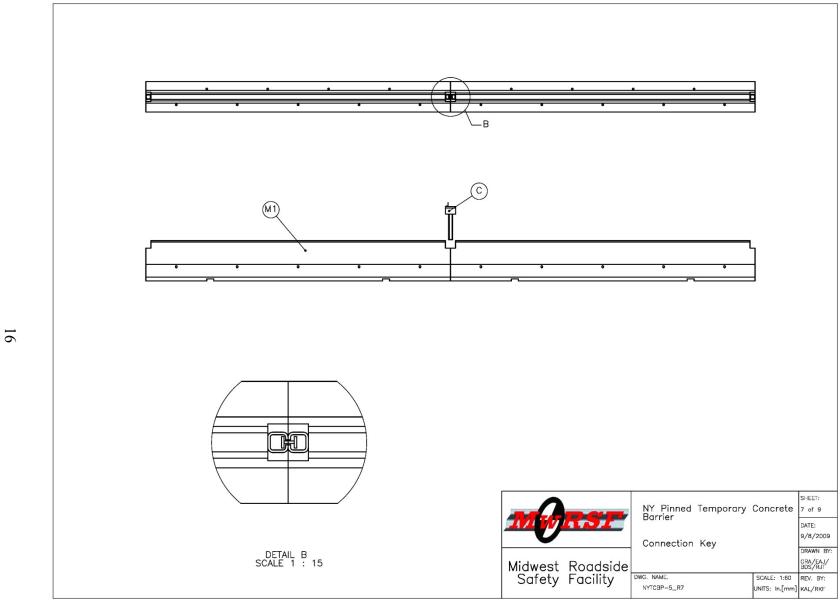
Temporary Concrete Barrier Connection Details, Test No. NYTCB-5
